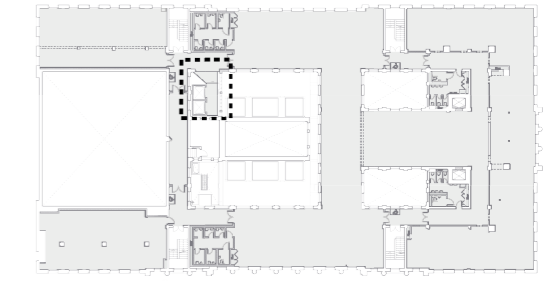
Proposed column layout at SE lightwell - Lo2
